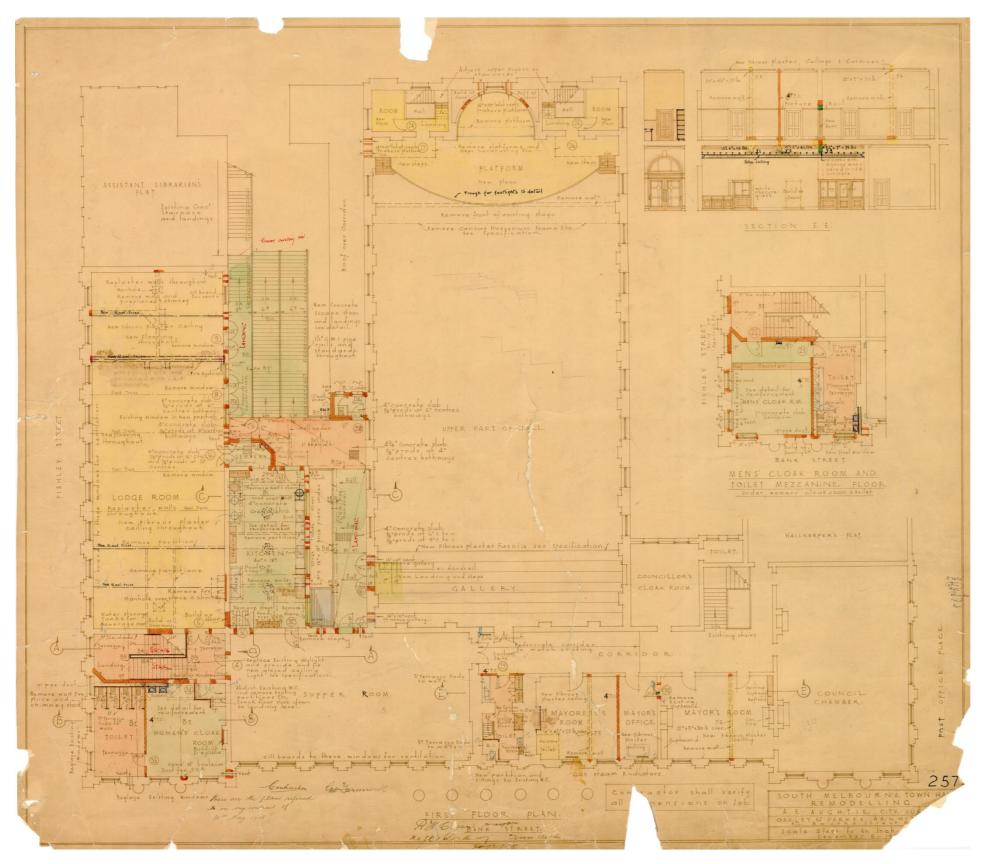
c. 1938 Oakley & Parkes first floor plan detailing renovations of the Main Hall stage and backstage area, mayor's offices, and Lodge Room and attached kitchens and mezzanine amenities Source: City of Port Phillip
